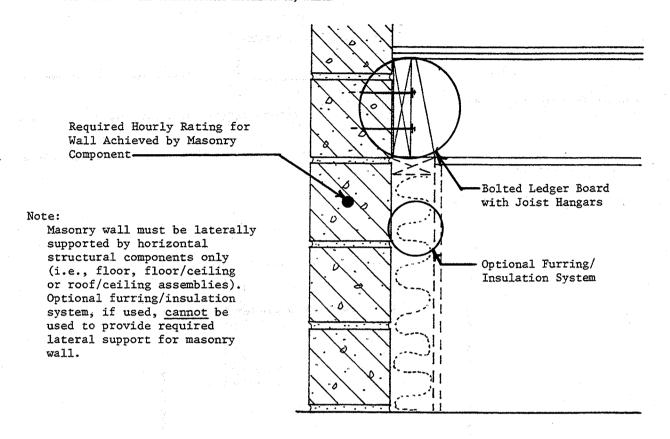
Single Wythe Masonry Wall (Bearing Condition)
